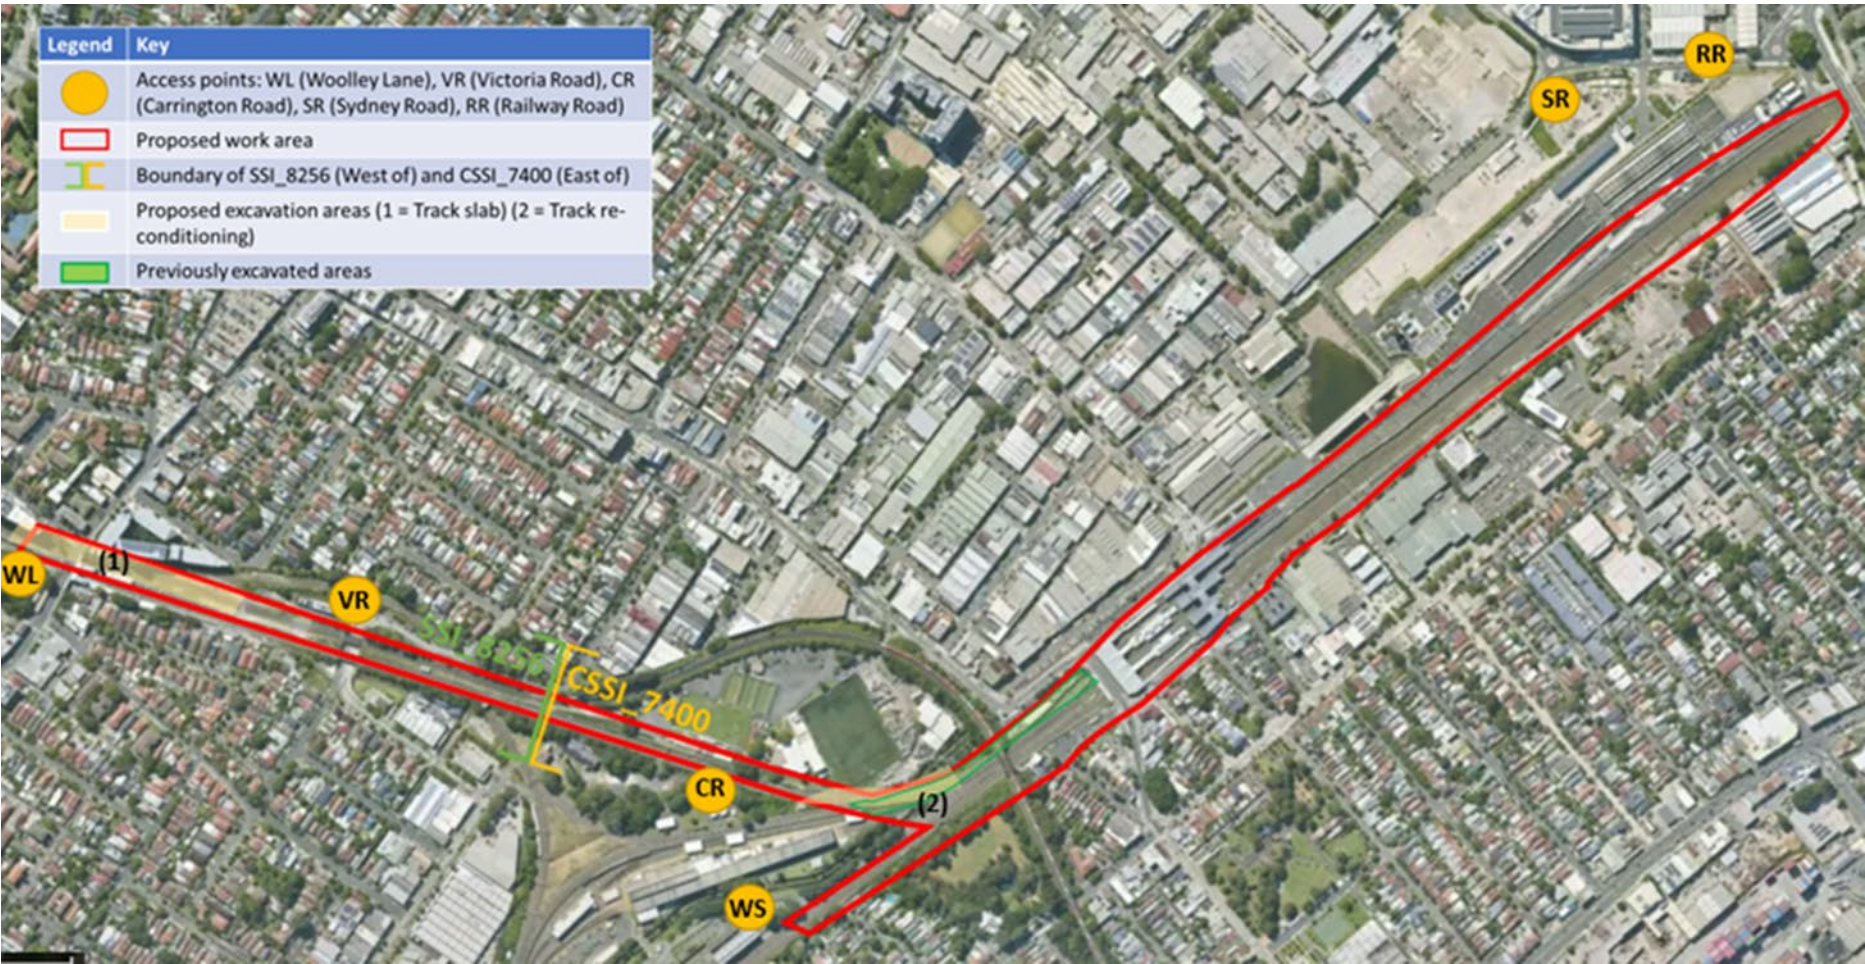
Marrickville to Sydenham Site Layout (source: Sydney Metro City & Southwest - Sydenham to Bankstown -Planning Approval Consistency Assessment Form: Final track configuration works to complete the connection between Marrickville Station and Sydenham Station, October 2023.)
